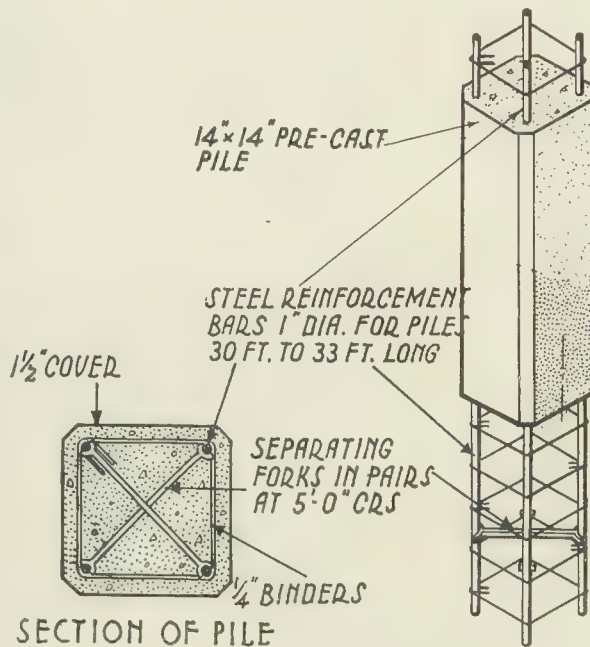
REINFORCEMENT FOR CONCRETE PILES
